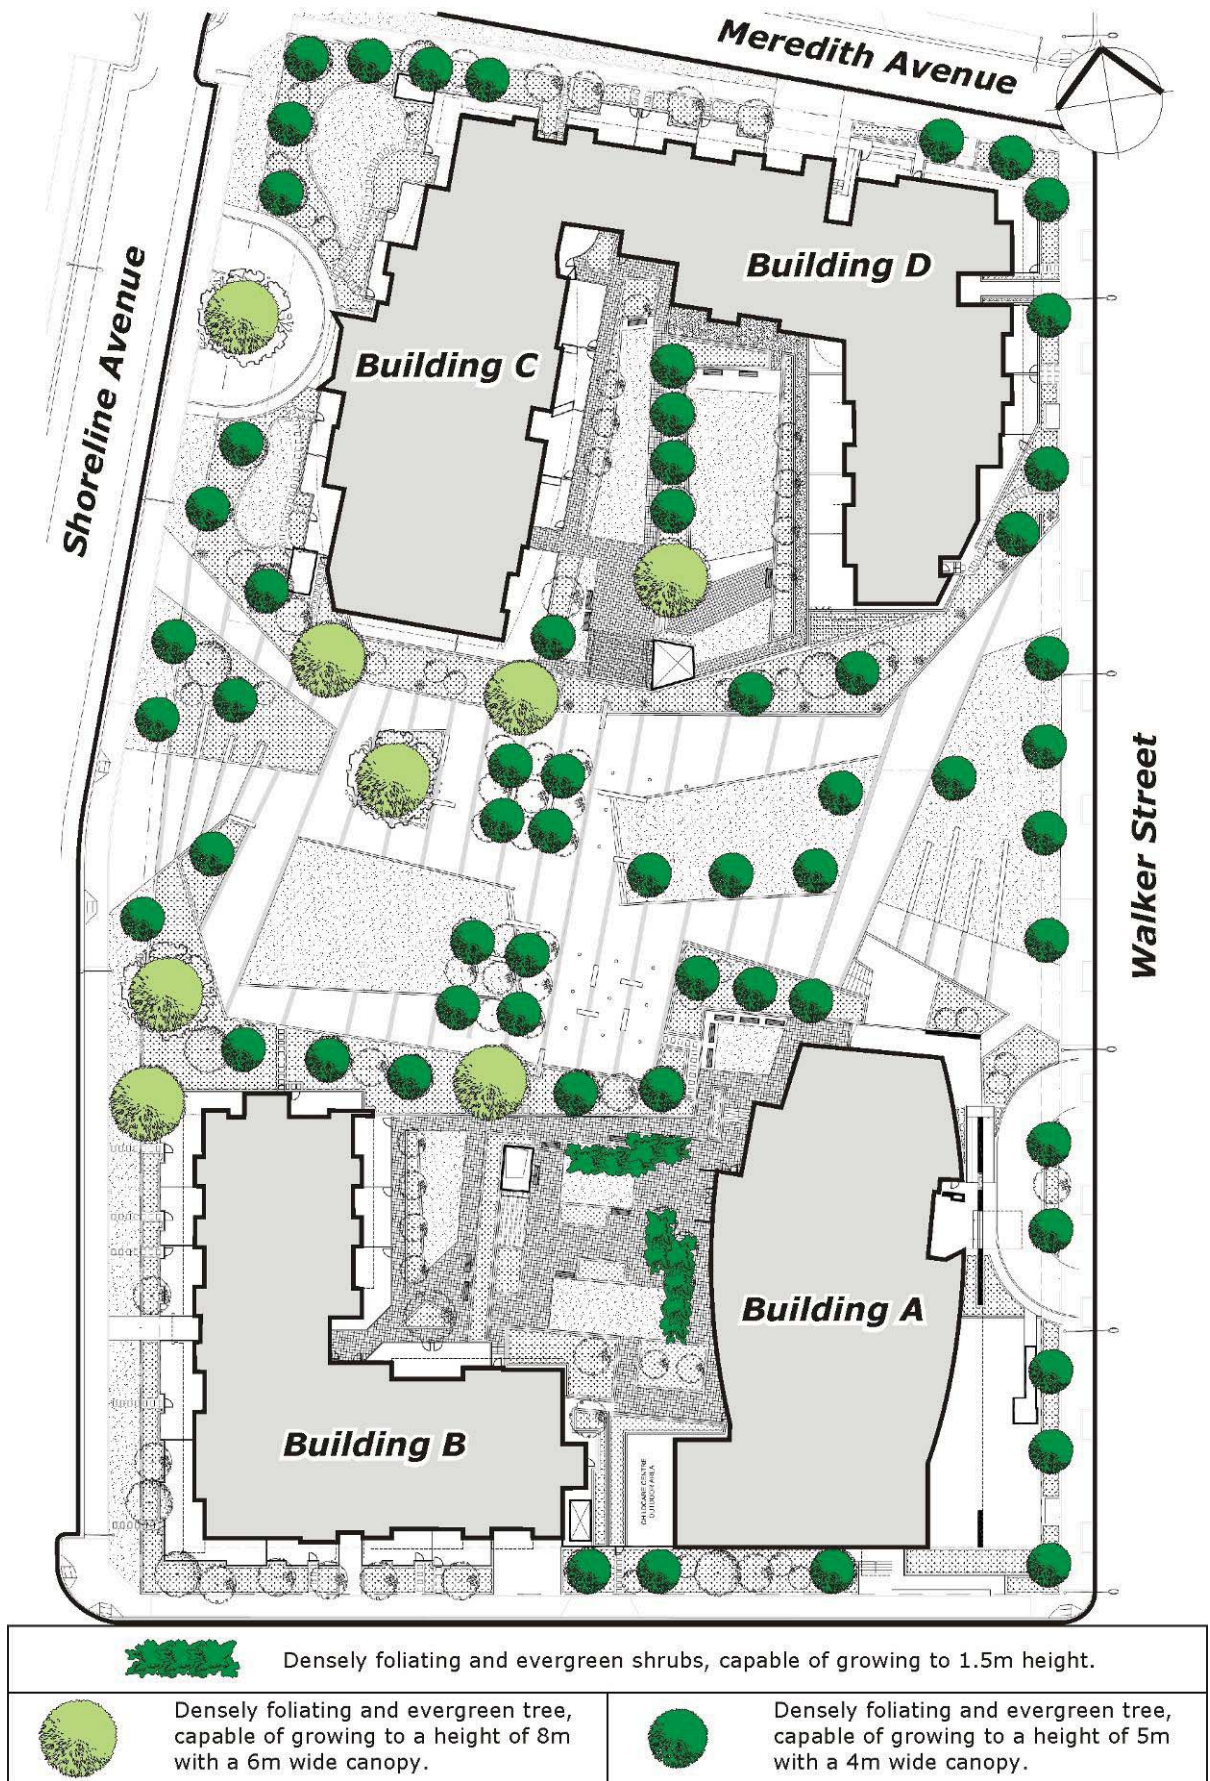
Recommended *Minimum* Tree Planting Layout for the Ground Level
